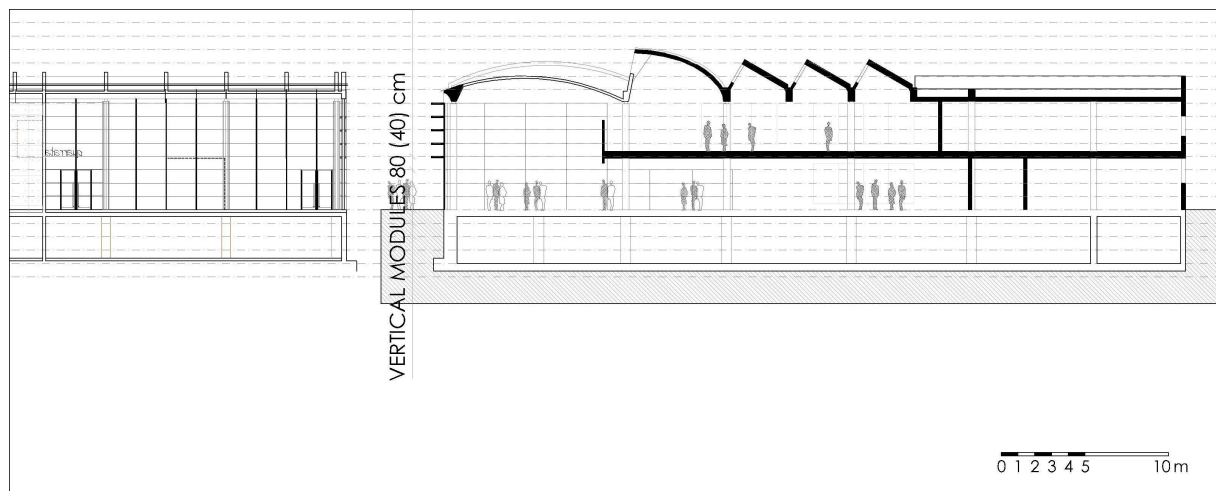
The section: vertical modular (40 + 40 cm) and skylight systems.
